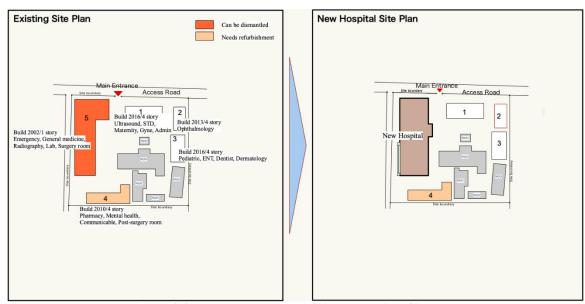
Phnom Penh Municipal Hospital Site Plan
